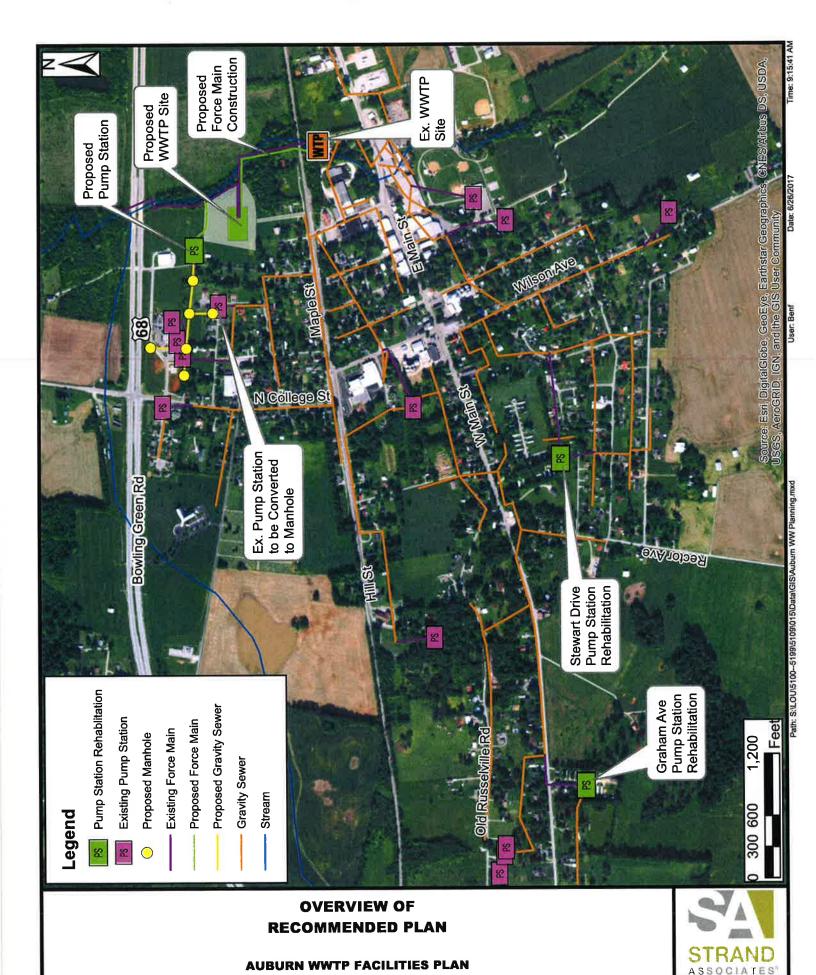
Auburn Wastewater Facilities Plan, Overview of Recommended Plan
